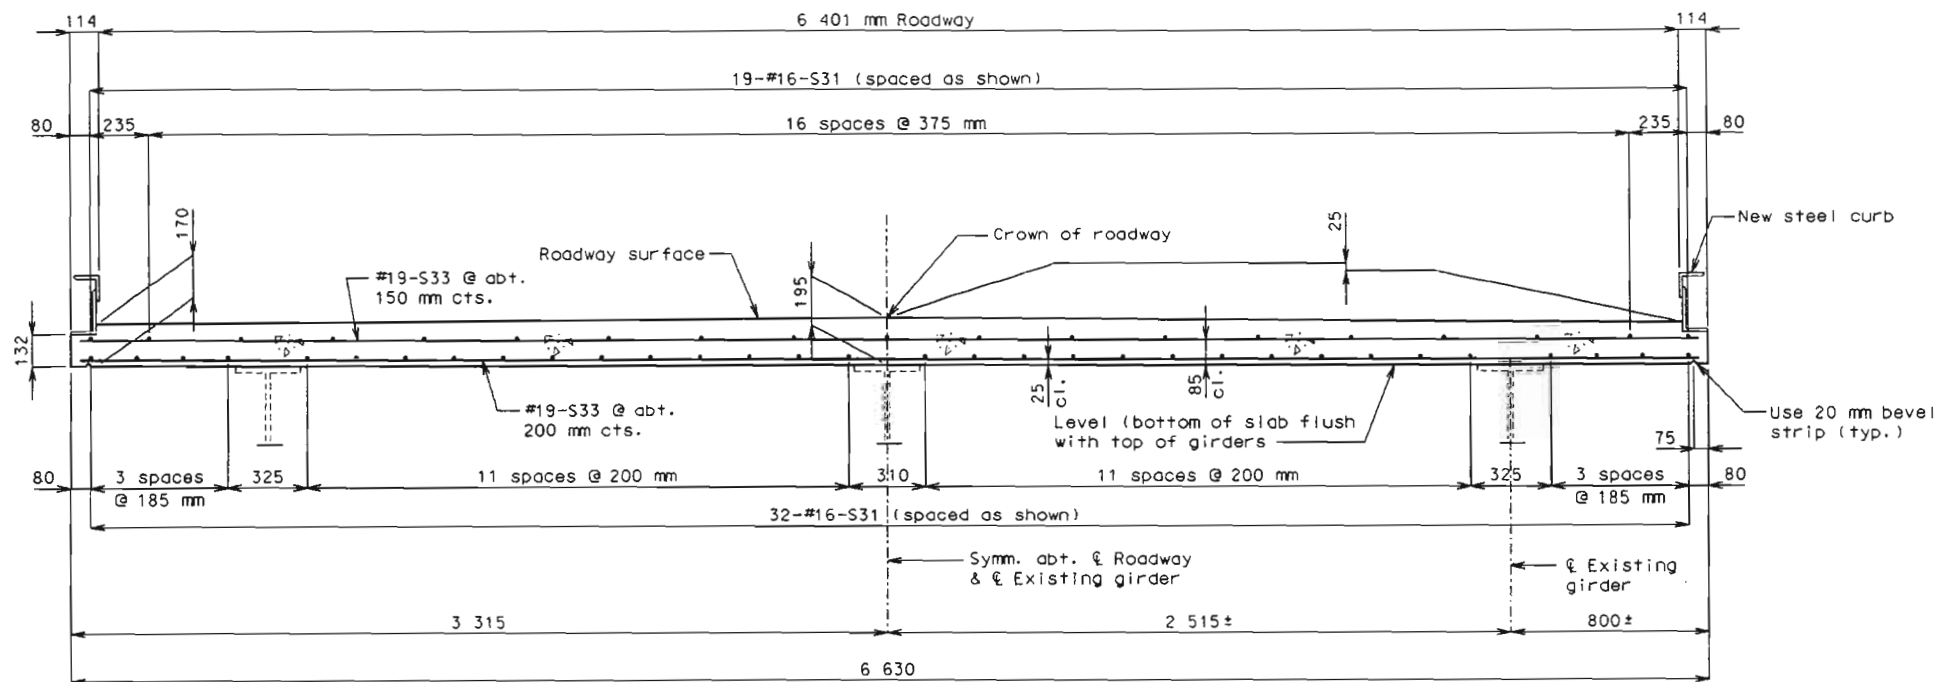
DETAILS OF DECK REPLACEMENT AT BENT NO. 3
